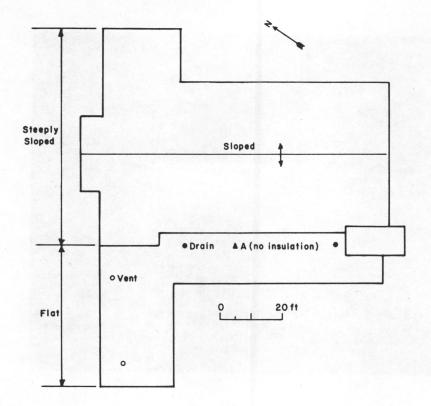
Plan view of Building 63. The sloped portion was not surveyed. The flat area contained subtle thermal anomalies when viewed with the infrared camera.
